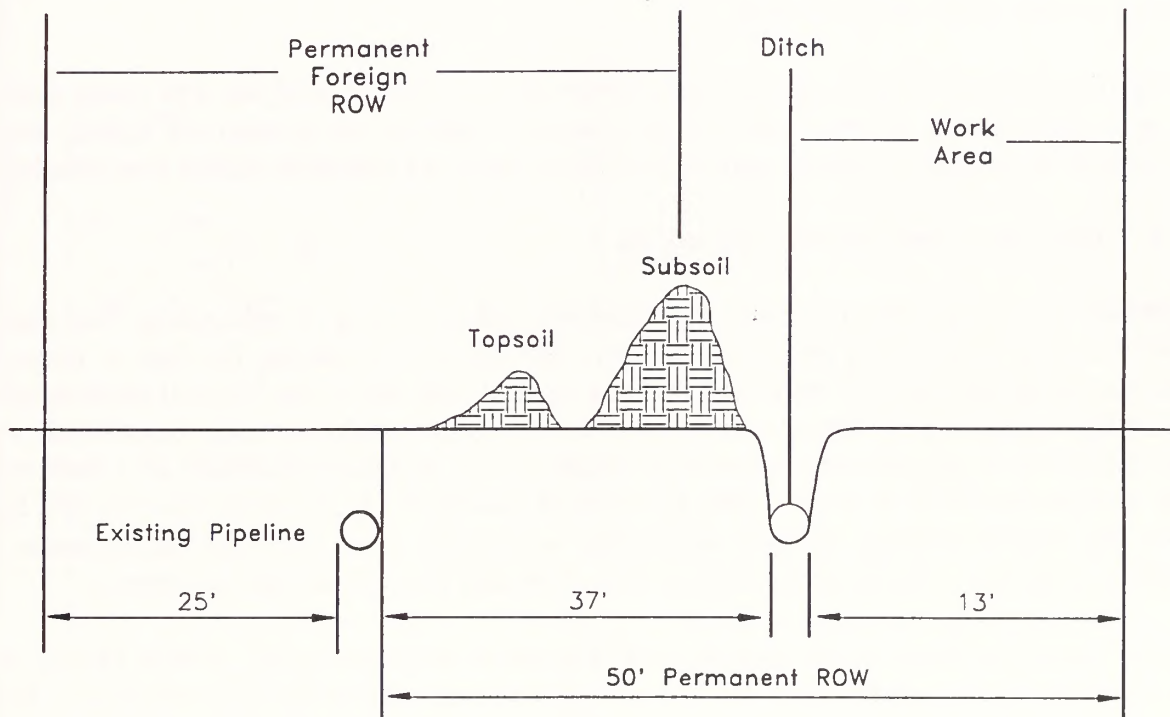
Typical Schematic of Pipeline Installation.
